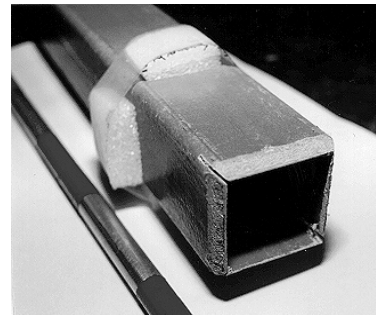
End preparation of FRP unit within the 65mm steel box showing 60deg. chamfer and corner cuts.
